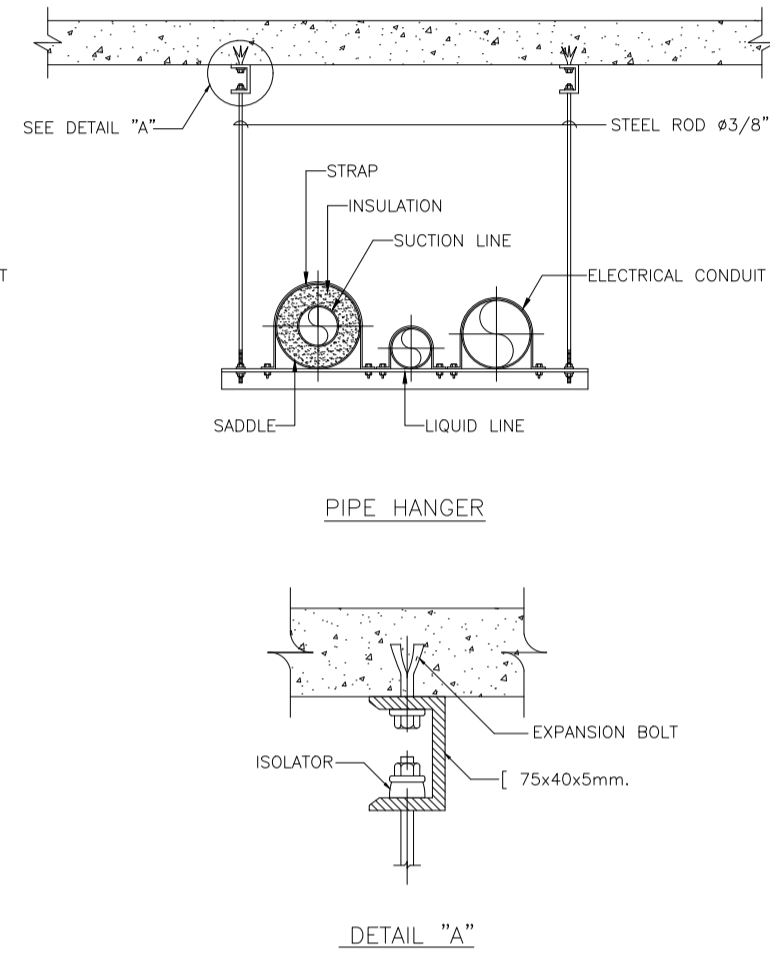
DETAIL OF REFRIGERANT PIPING AND INSULATION INSTALLATION
